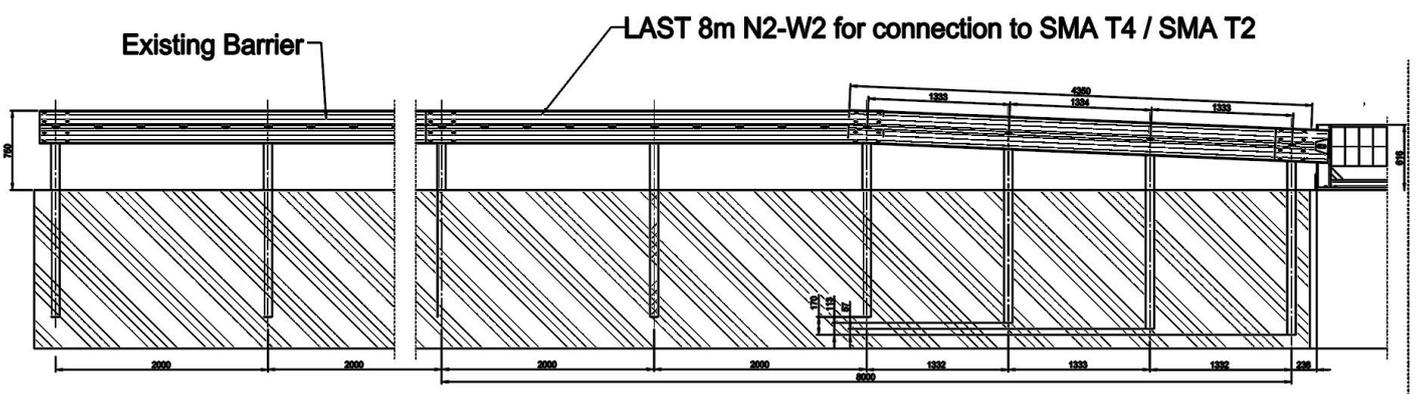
Connection of the barrier to the End Terminal – complete view.
